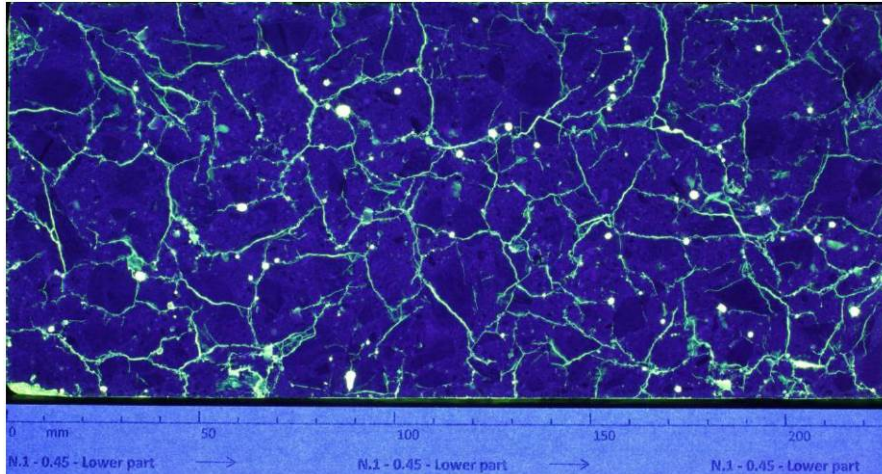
Cut prisms of a heavily cracked concrete (tested with the concrete performance test, recorded expansion: 0.43%) impregnated with epoxy resin containing a fluorescent dye activated by UV-light. From Lindgård et al. [2012].
